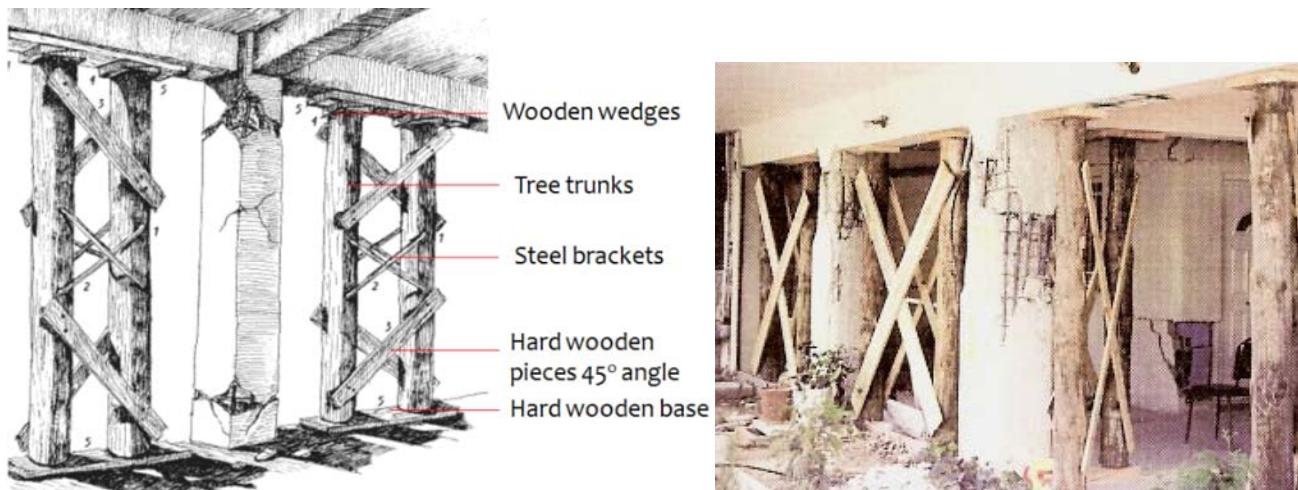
Propping using tree trunks either side of damaged column (EPPO, 2000)
